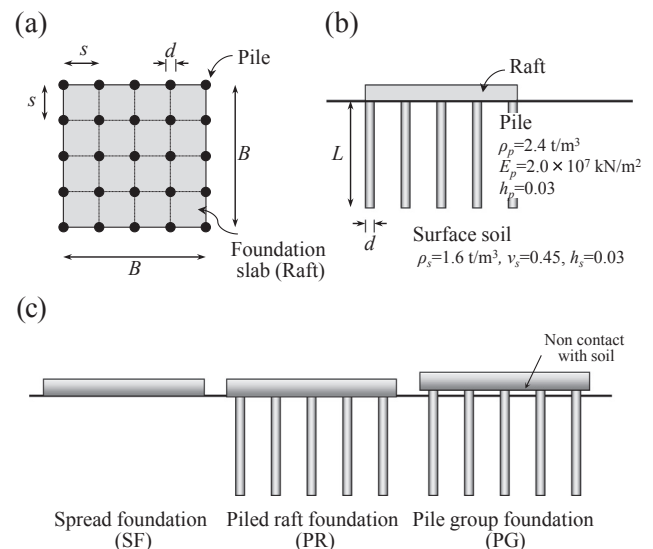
Analytical model; (a) plan view; (b) elevation view; (c) foundation type.
